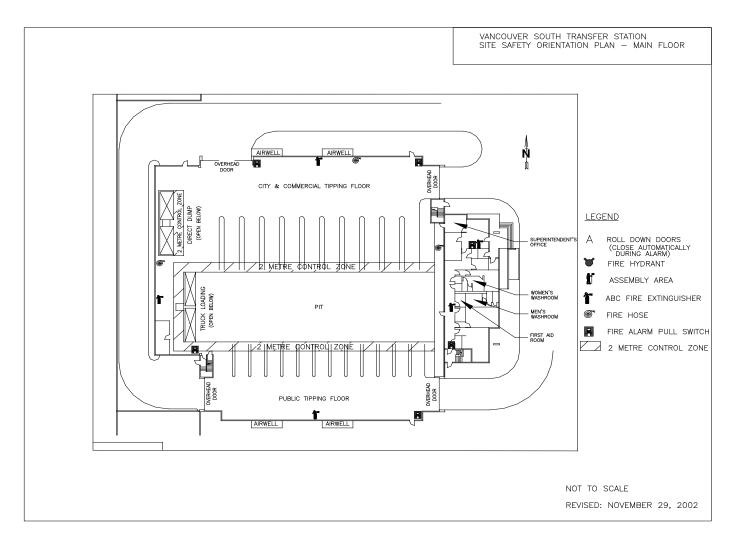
Vancouver South Transfer Station, Main Floor, Plan View
